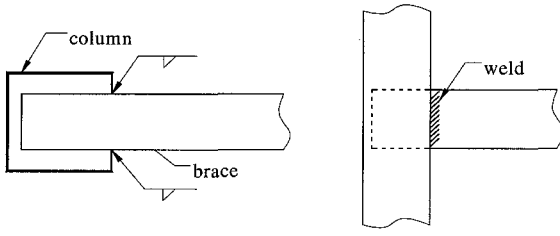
Joint Detail Resisting Post Twisting (Brace Narrower than Post)
